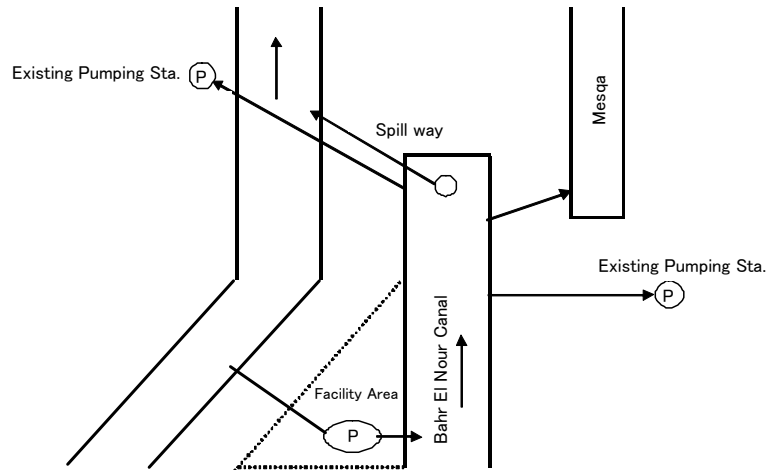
Layout of Drainage Water Re-use Facility
